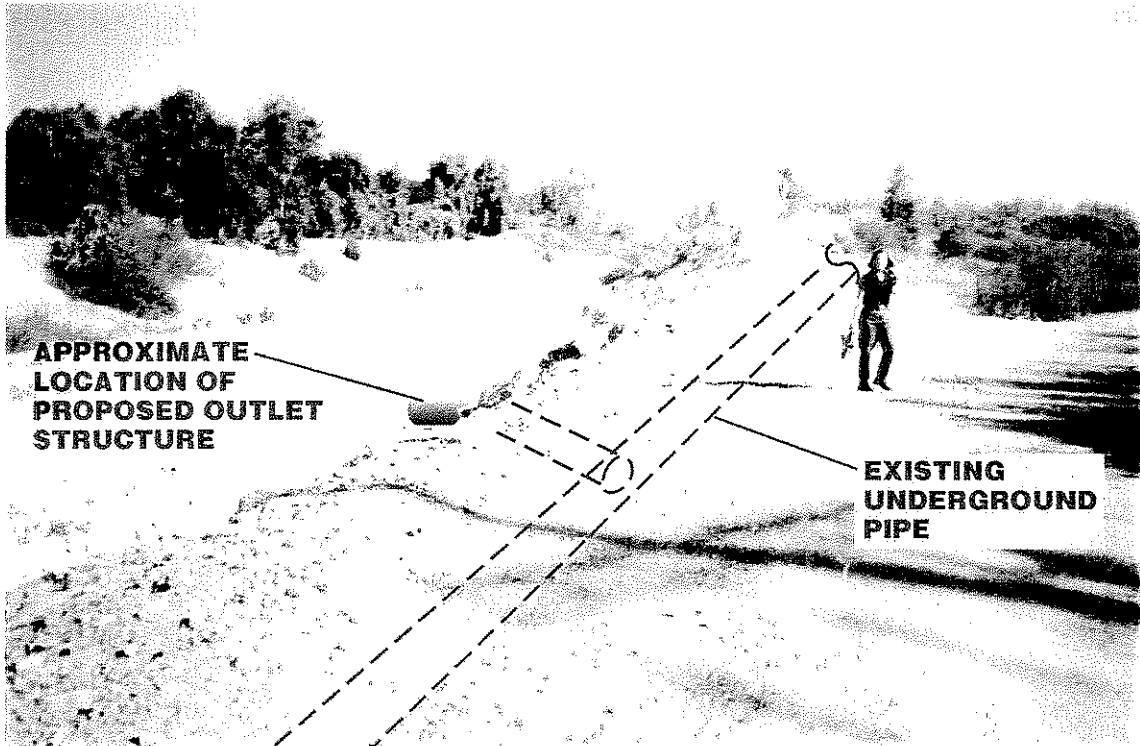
View of Santiago Creek and south bank. Note the approximate location of the proposed outlet structure.
